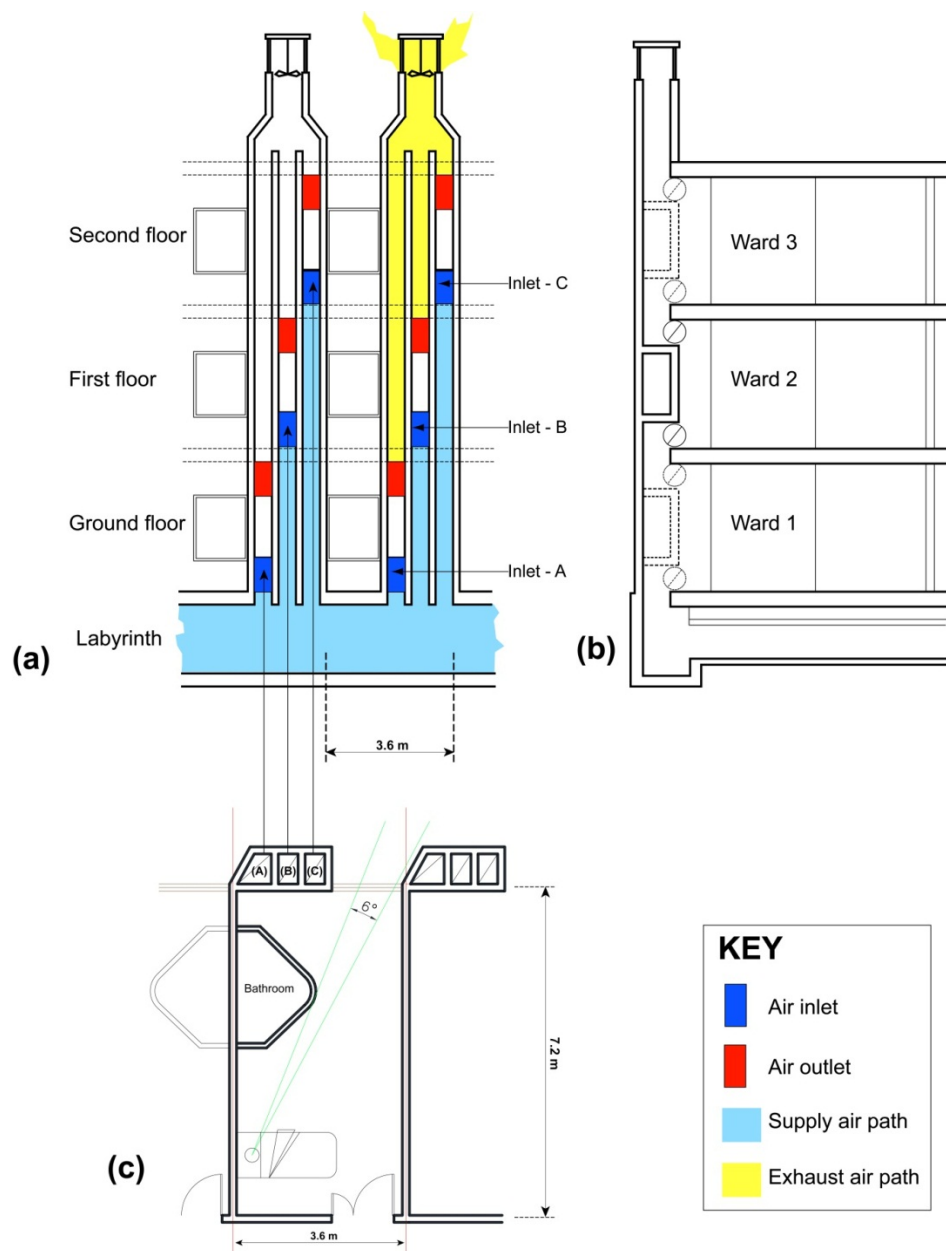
Schematic design of the S&A ward showing (a) Facade (b) Section (c) Floor Plan
